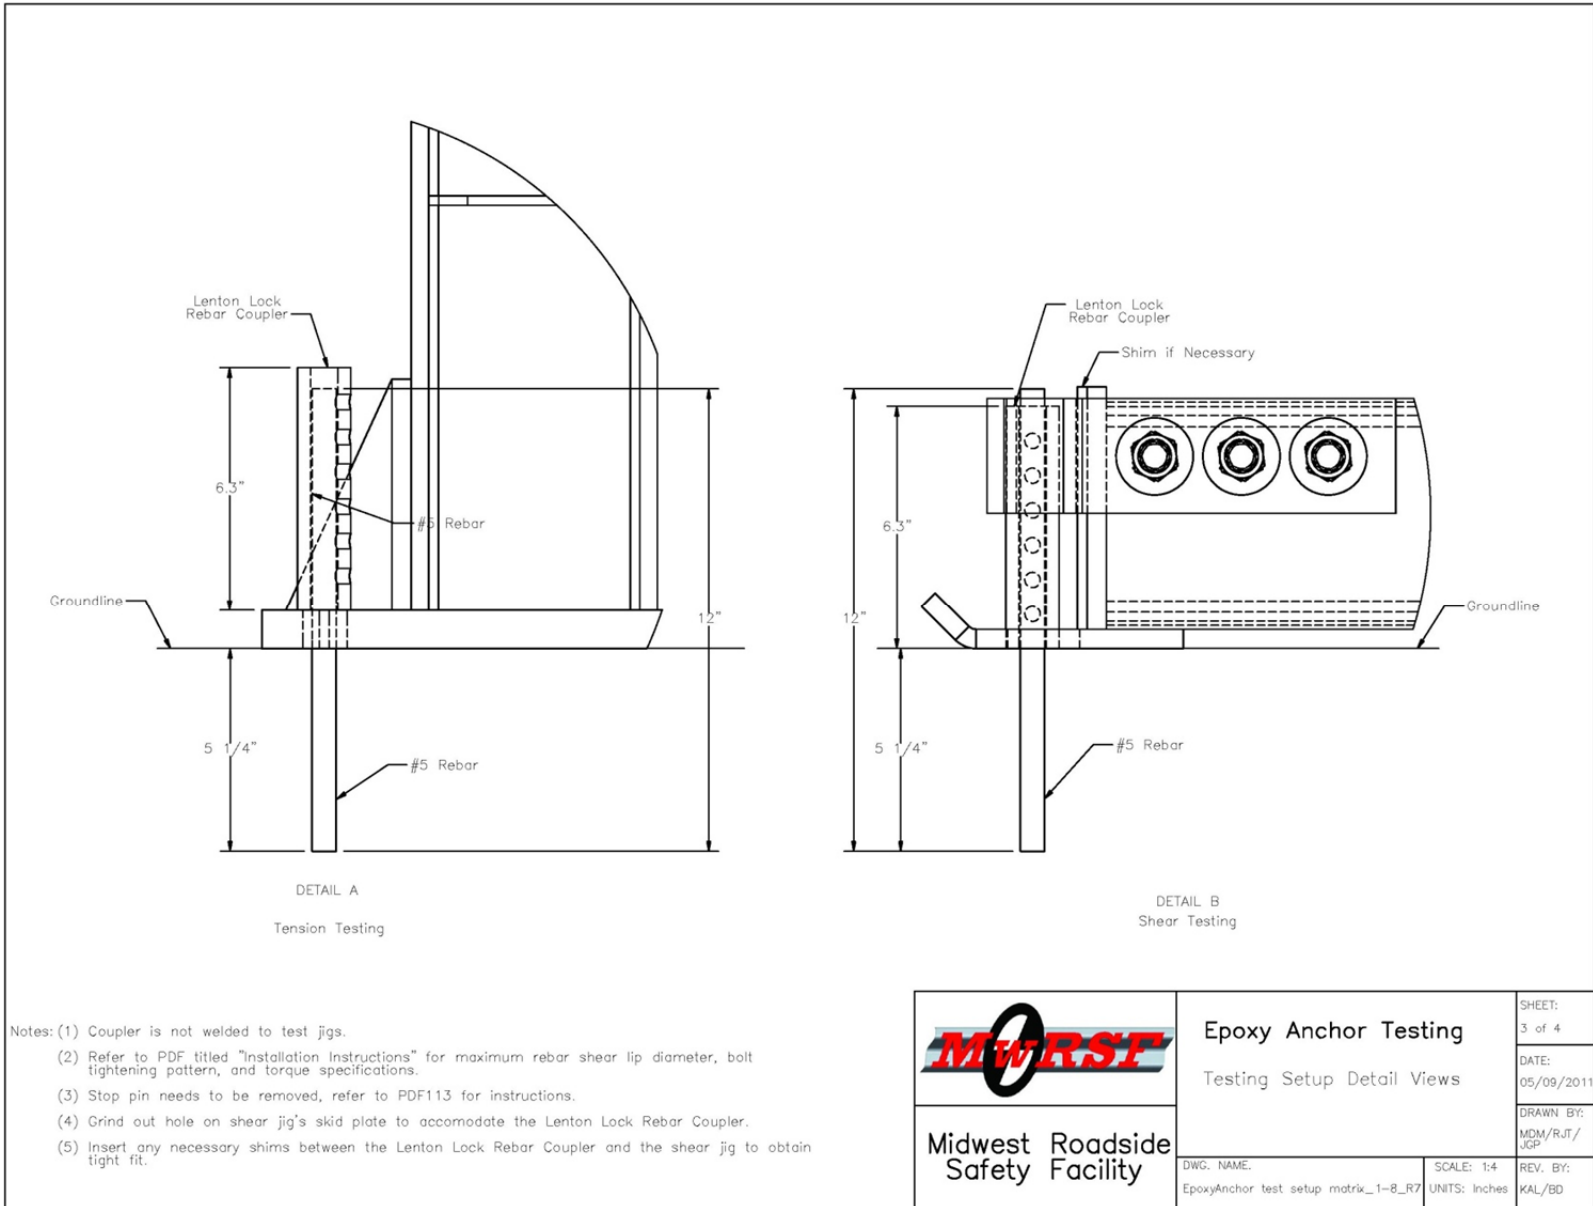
Anchor Attachment Details, Test Nos. WEAB-1 Through WEAB-8
